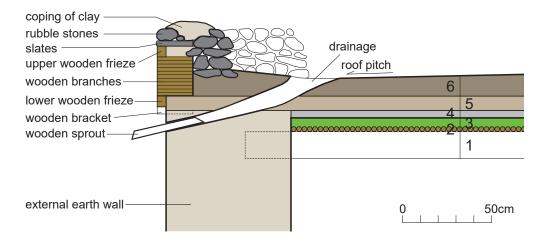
Fig. 8.3 Section of a traditional flat earth roof construction.
